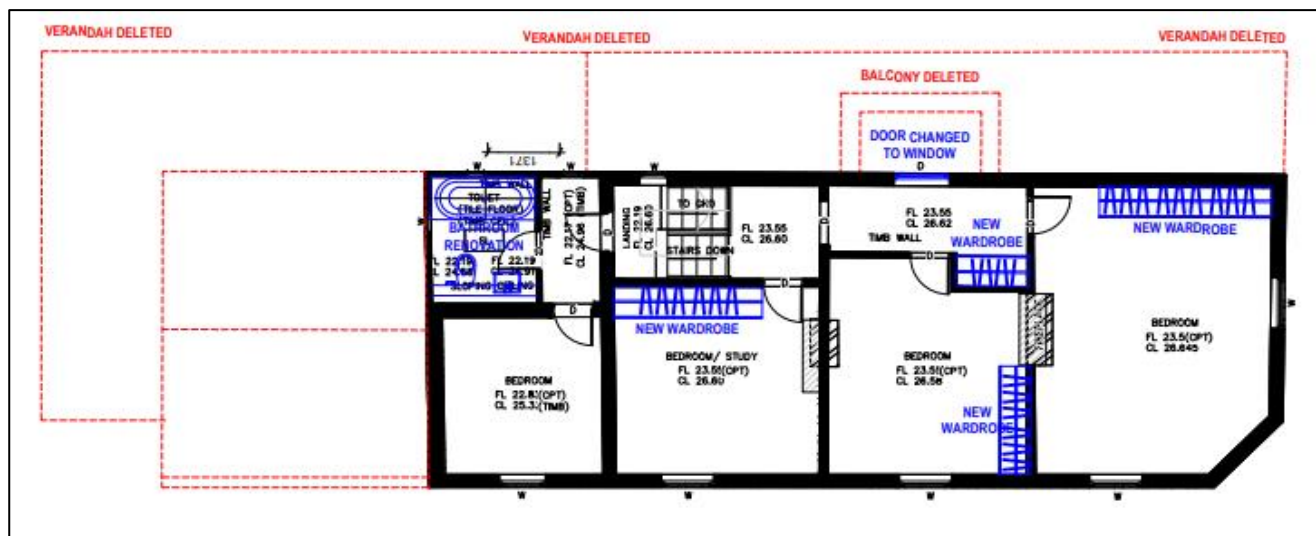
Extract of applicants submitted No.25 Stanley Street – First Floor Plan.
